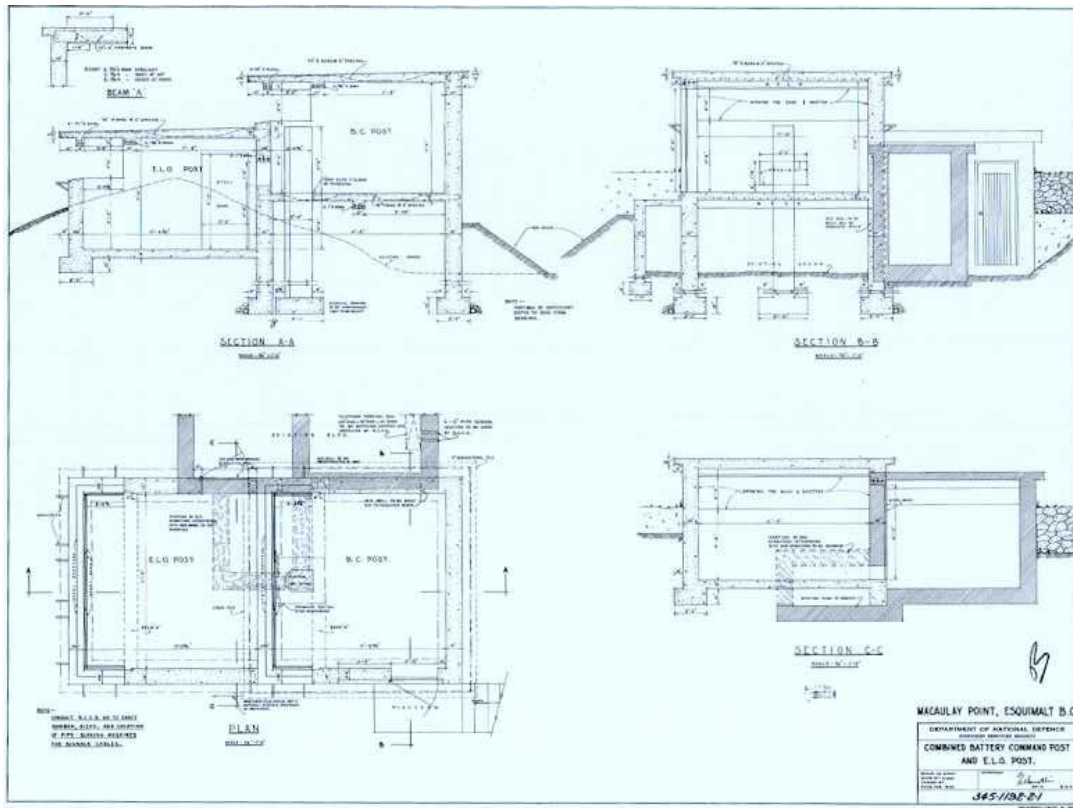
Plan and cross sections of WP1192, Battery Command Post (DND, 1964).
